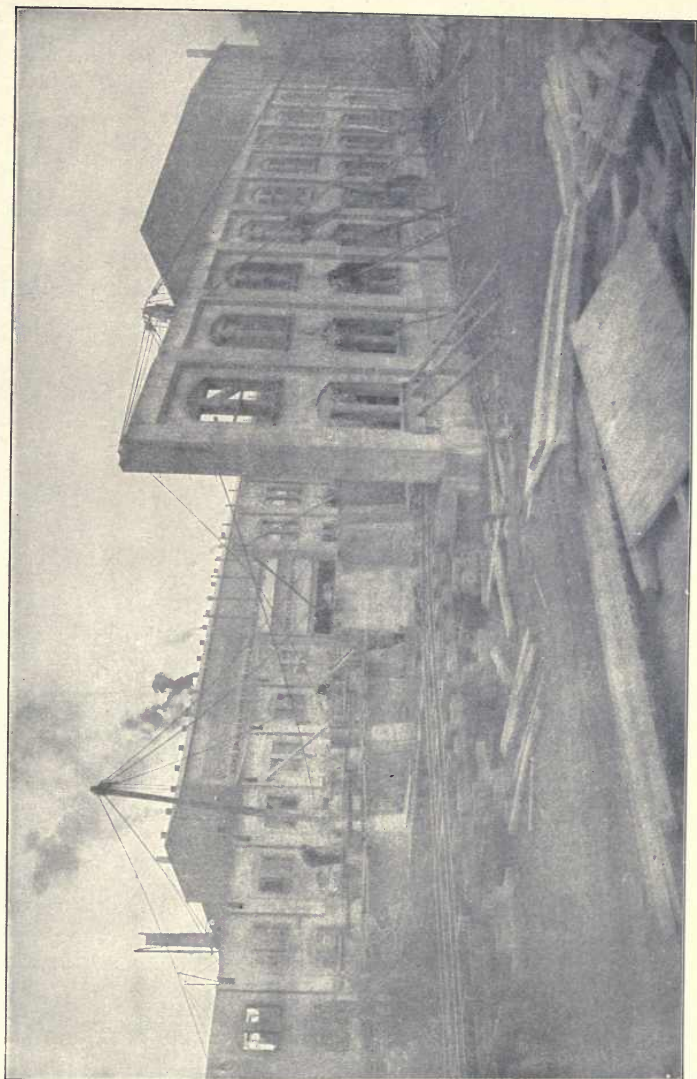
Side Wall of an Atlas Portland Cement Company Building. (See p. 173.)
